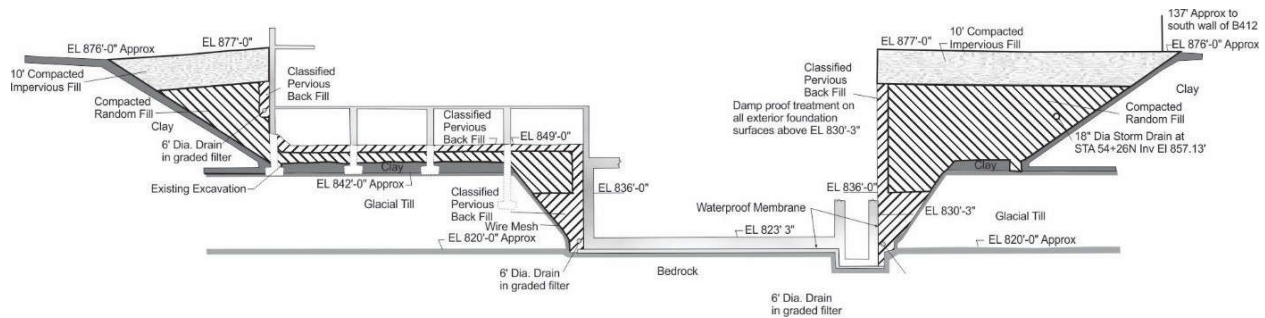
Cross Section of WR-1 Foundation Showing Expected Arrangement of Backfill
